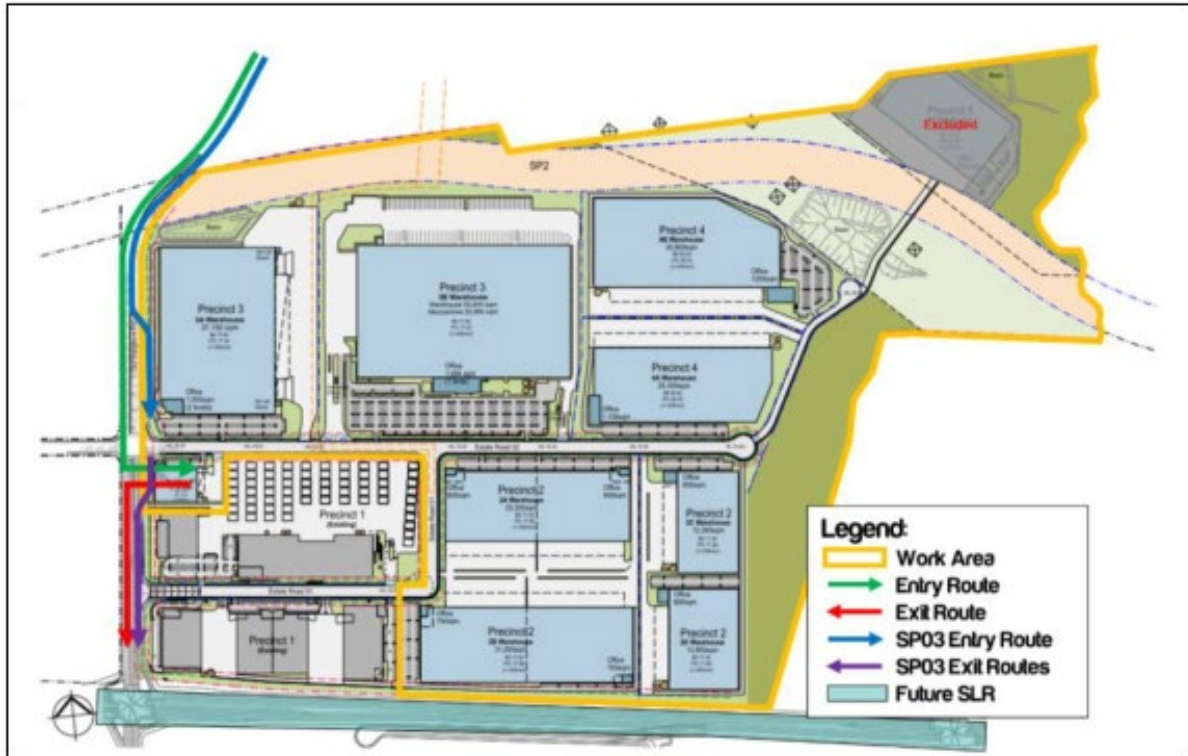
Access during Stage 4 (Milner Ave/Old Wallgrove Road Intersection Upgrades)
